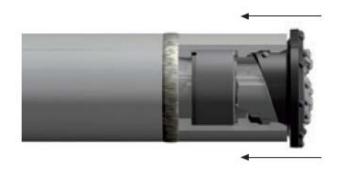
Pulling the drill string backwards to lock the drive ring to the casing extension.
